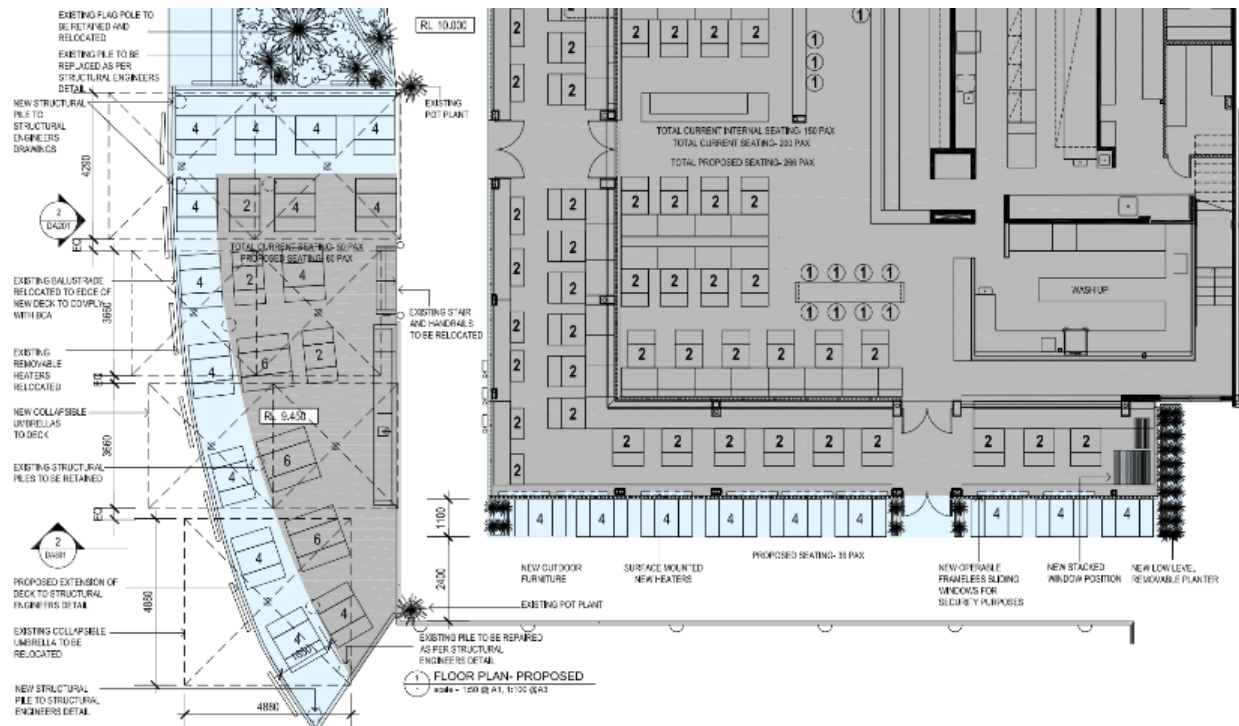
Extract showing the overview of the proposed works to the lower and upper deck showing the extent of the additional seating (Source: Squillace, General Arrangement Plan Proposed, Drawing no. DA 100, issue P9, 12.06.20).
